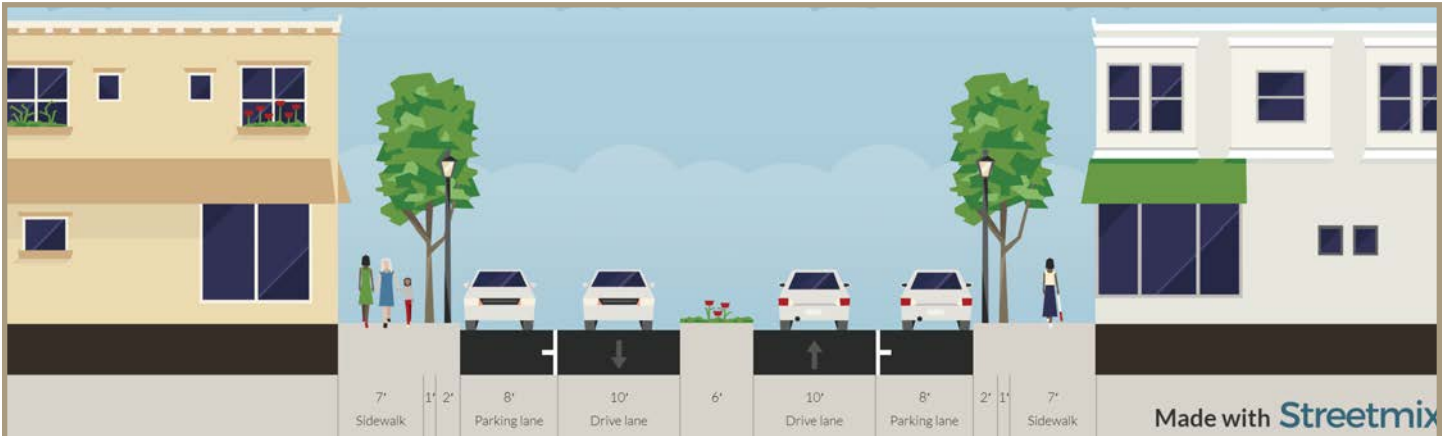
North Beverwyck Road with a center median and expanded sidewalk buffer zone.
